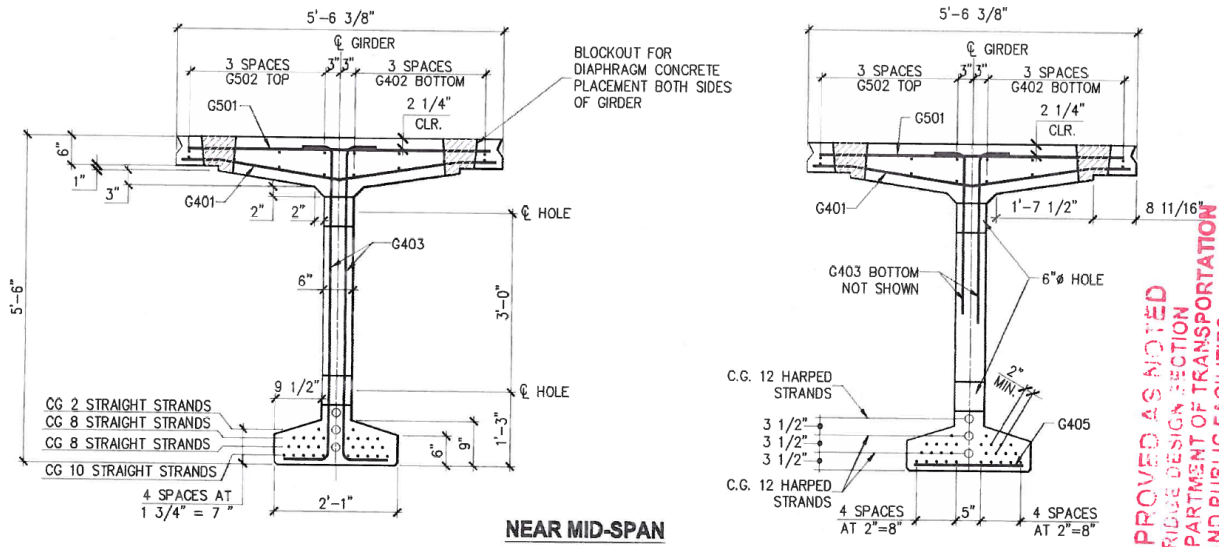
Typical Cross Section of a DBT Girder in the Tulsa Creek Bridge
